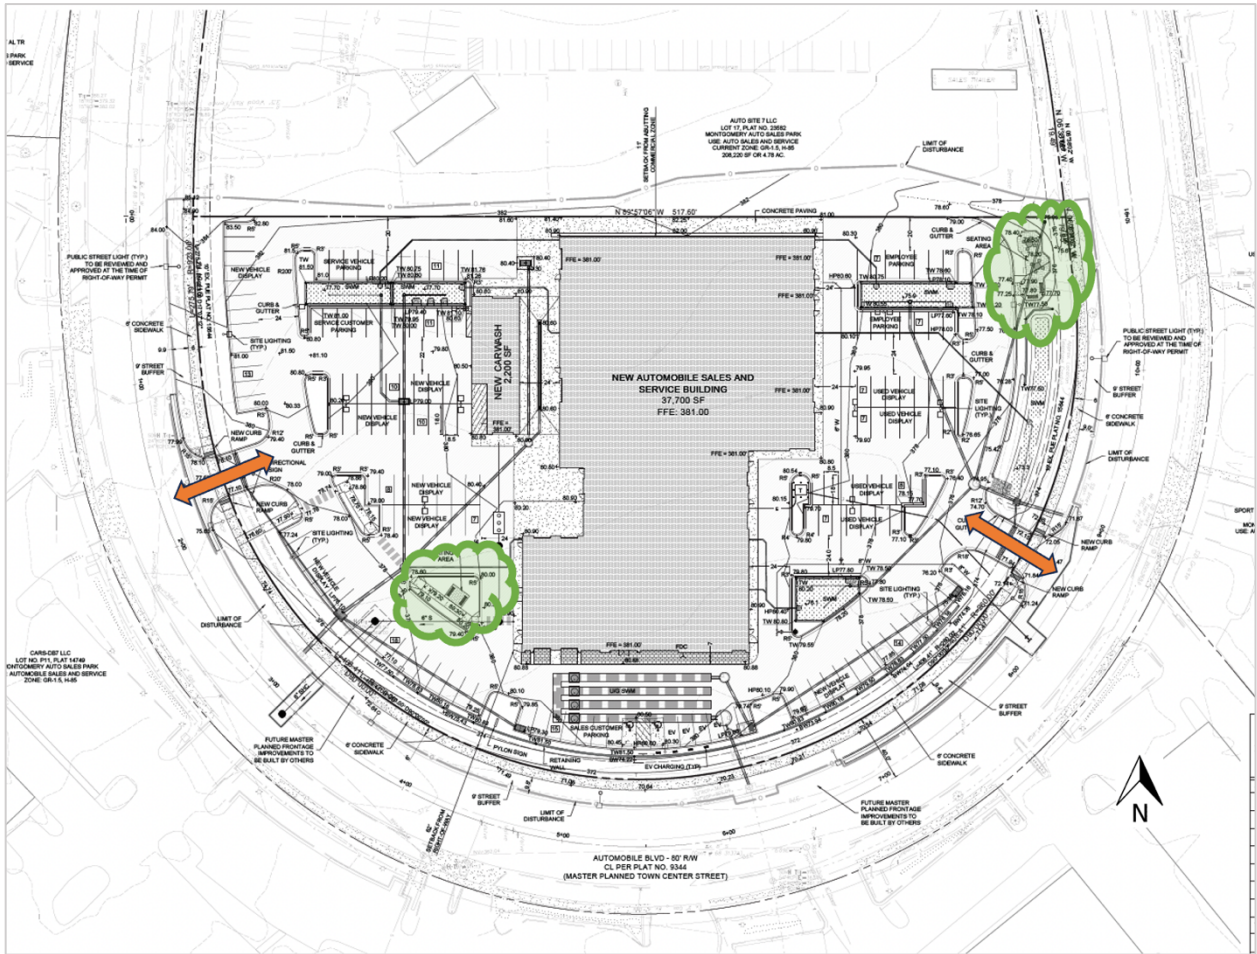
Proposed Site Plan Amendment on Lot No. 18 with new building, car wash, driveway access, and outdoor seating areas (shaded green)
